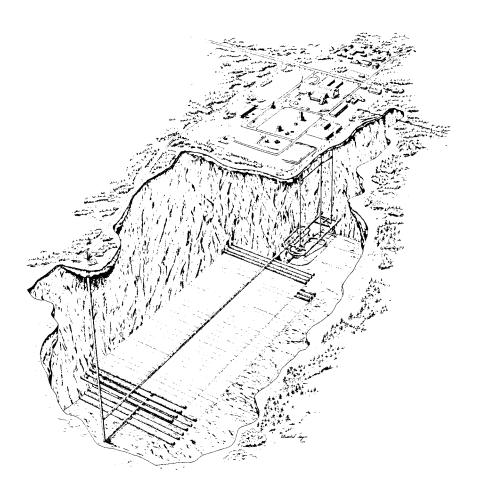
SFL-BS (not including SFL 3-5). General plan.
